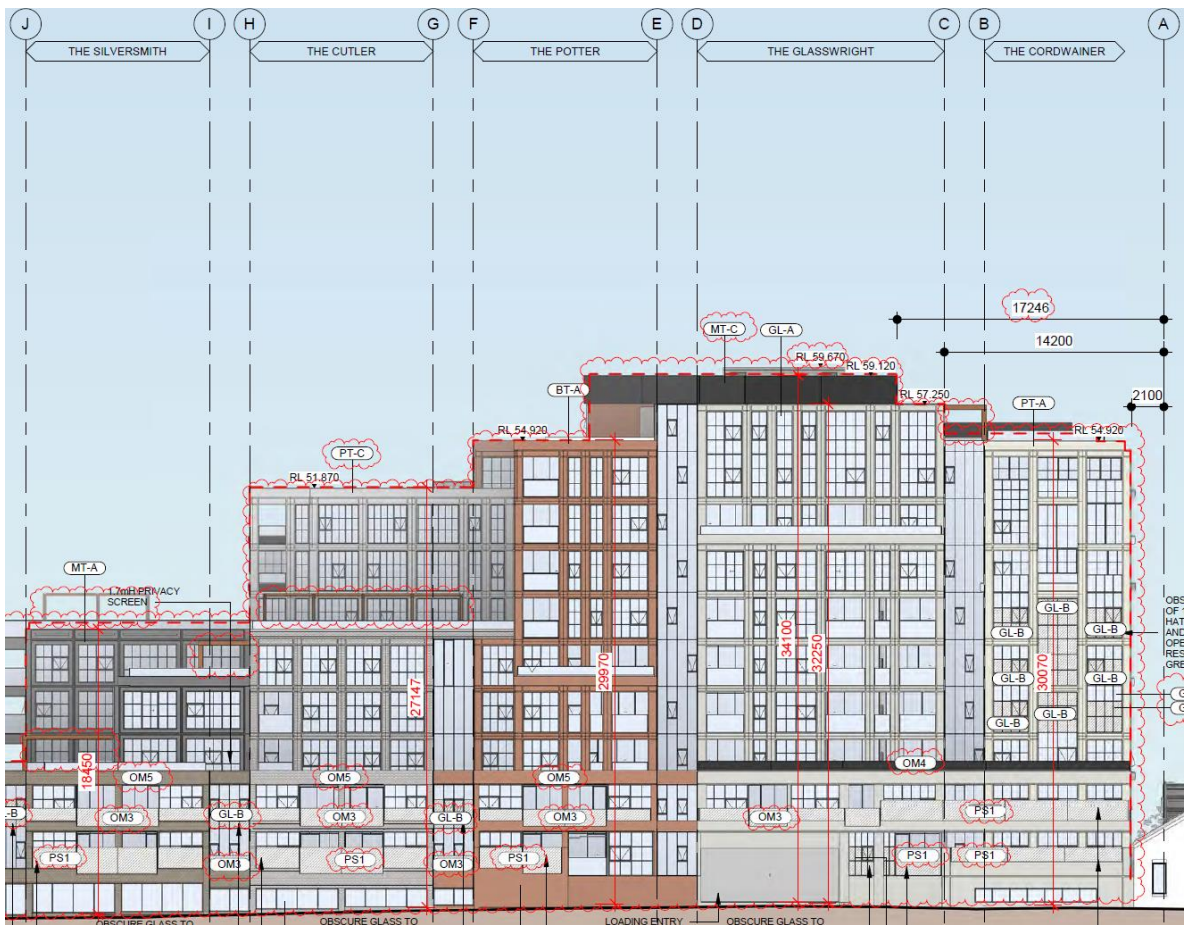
Proposed laneway (east) elevation (Grid J to Grid A)
